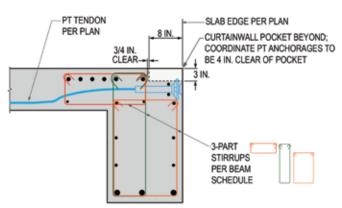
The spandrel beam reinforcing was coordinated with curtainwall anchor pockets and PT tendon anchorages (Note: 1 in. = 25.4 mm)
